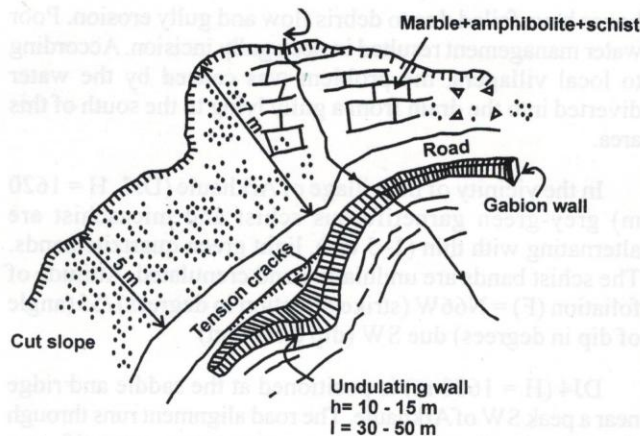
Sketch of landslide and undulating retaining wall south of Nagi
